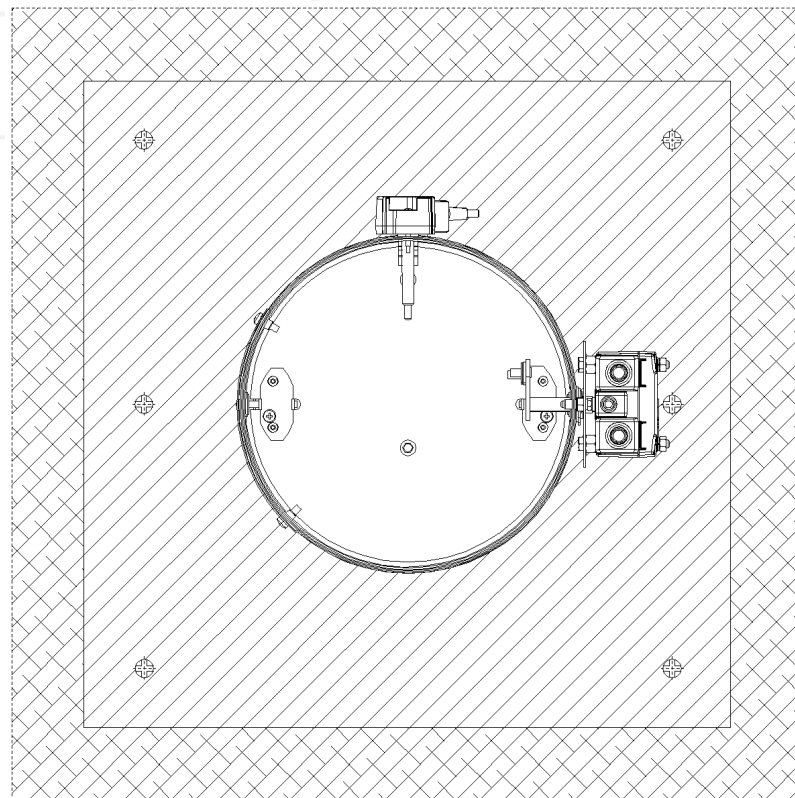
Installation method of fire dampers KTM-O in flexible wall with horizontal rotation axis of baffle
